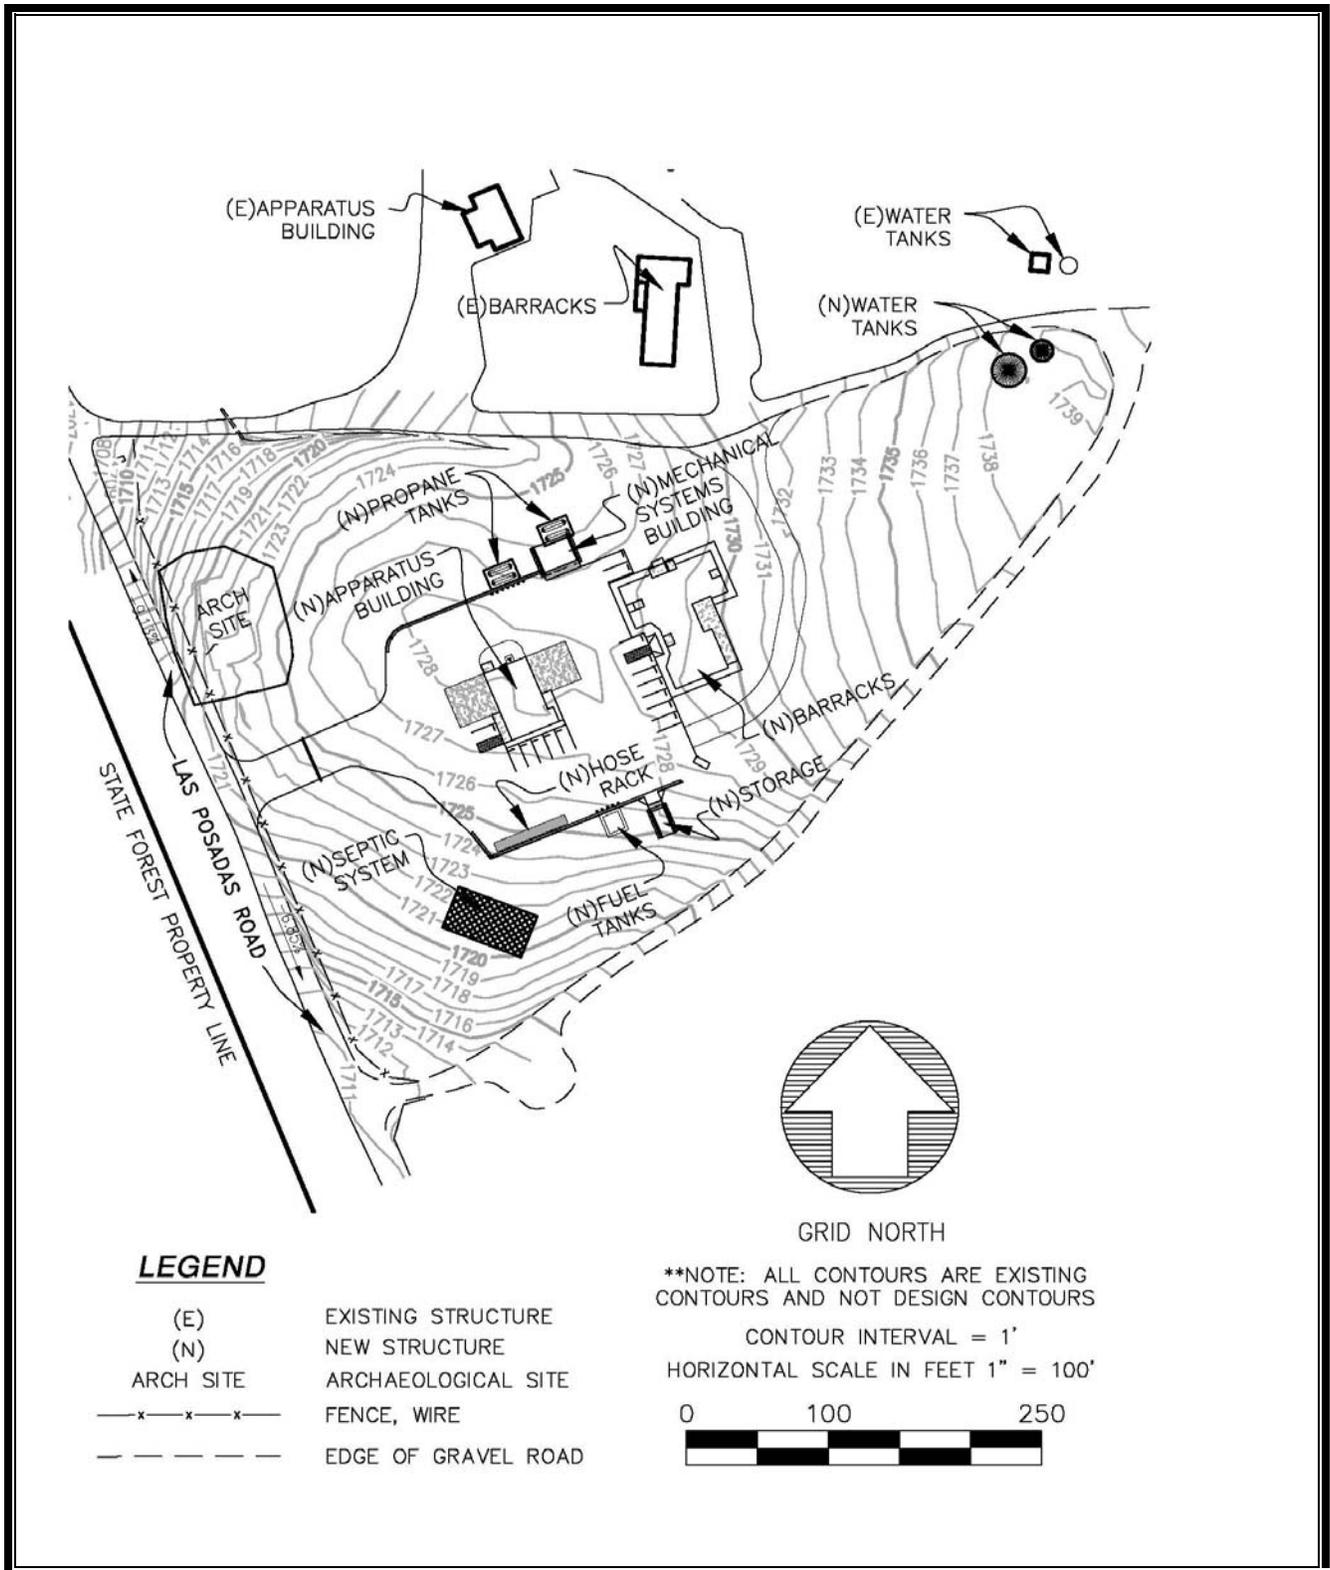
Project Site Plan. This Figure depicts the currently proposed building lay-out within the revised proposed fire station building site.
